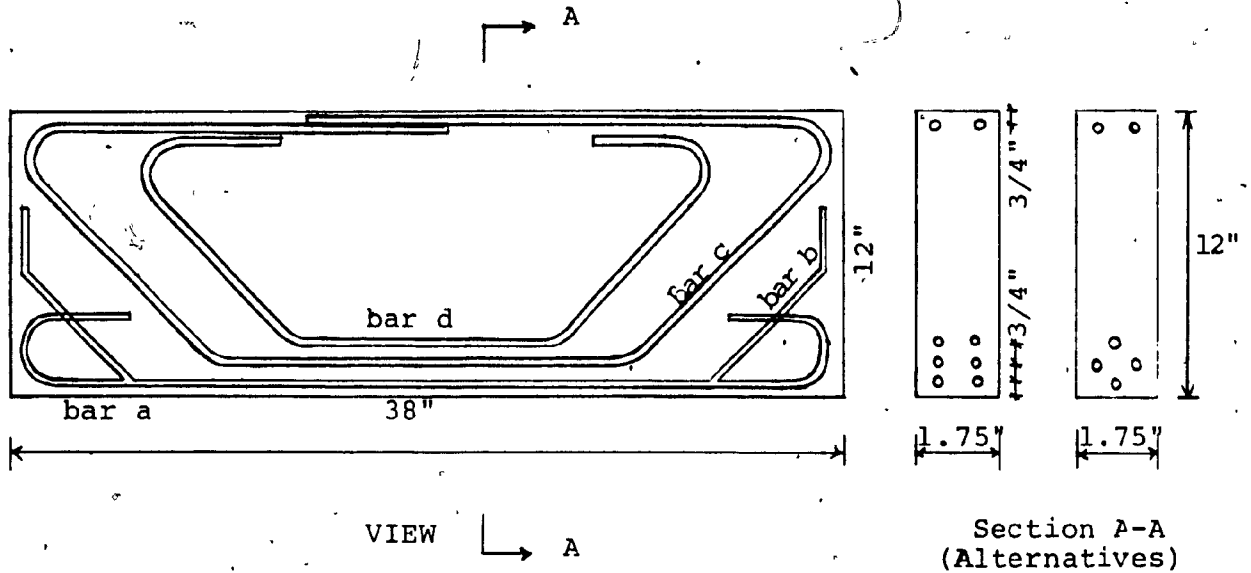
Location of the reinforcement and detail dimensions of the sample.
